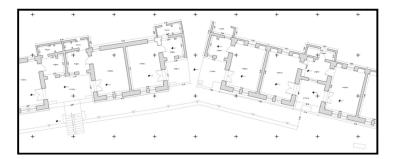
Detail from the floor plan of the complex of Lovokomeio.
